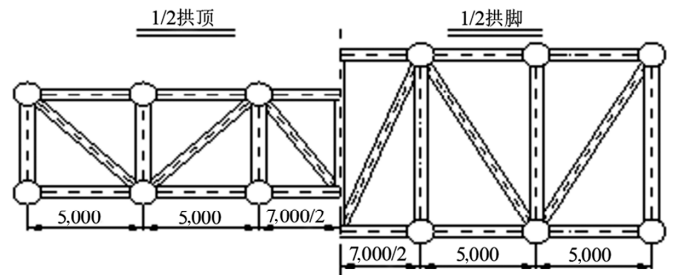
Cross section of the arch rib of the Xianghuoyan Bridge (unit: mm).
